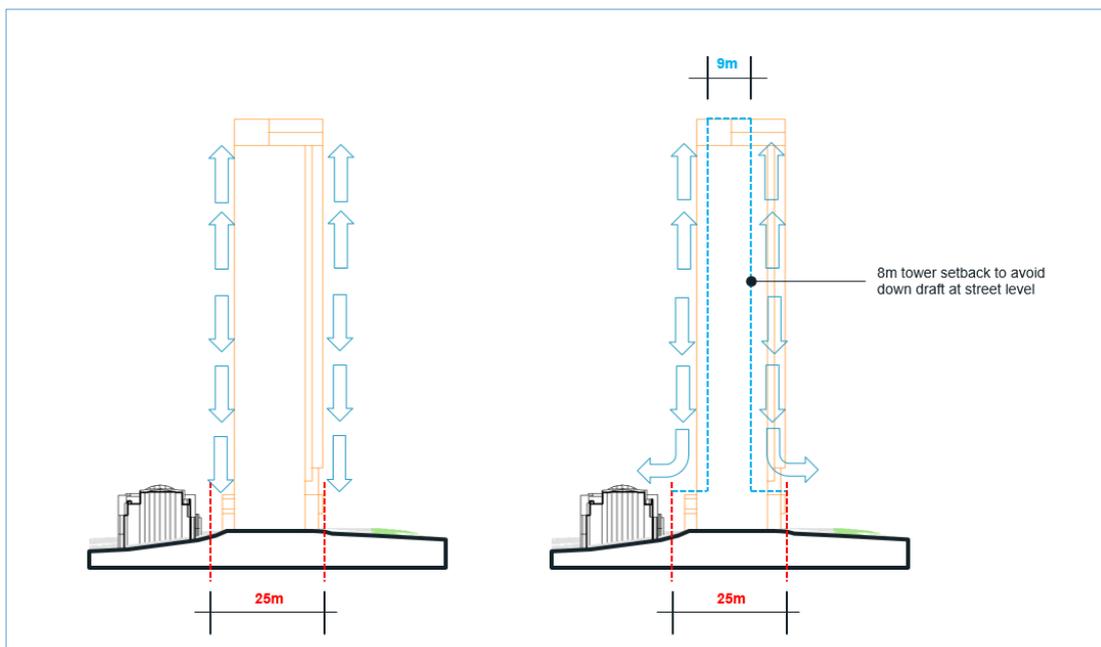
Proposed concept building form (LHS) and building form required to mitigate wind impacts (RHS)
